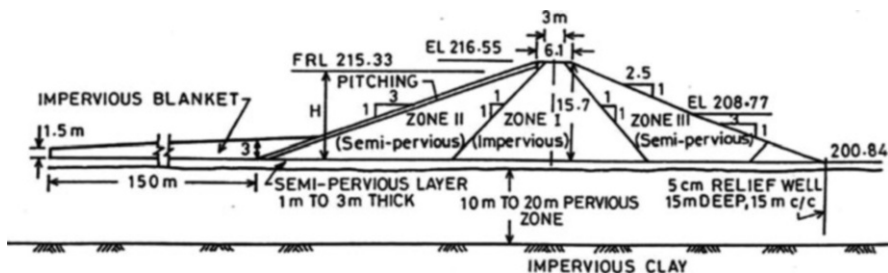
Typical zoned section of Nanak Sagar dam.
